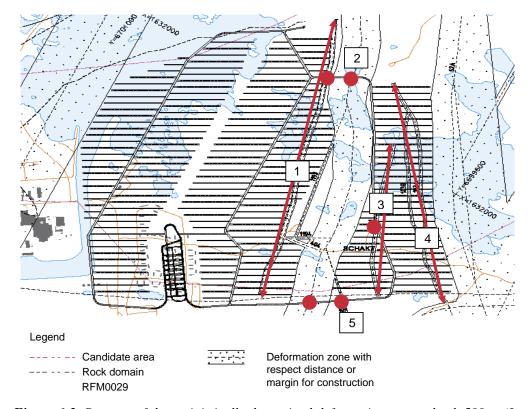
Passage of deterministically determined deformation zones, depth 500 m (Layout 3 and 4). Red dots indicate passages with transport tunnels or main tunnels and red arrows indicate passages with deposition tunnels. Numbers refer to the deterministically determined deformation zones given in Table 6-5.
